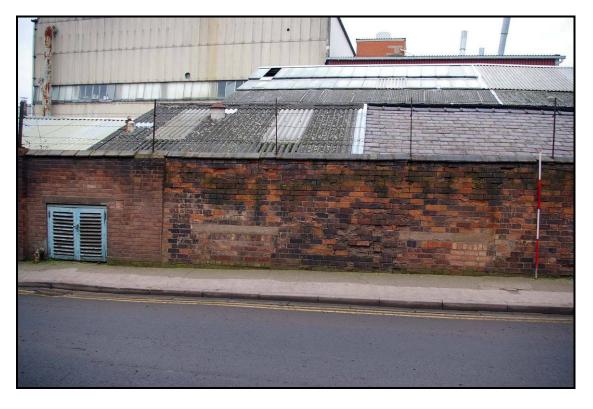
South wall of Building Y (left) and early phase of Building Z (right)
